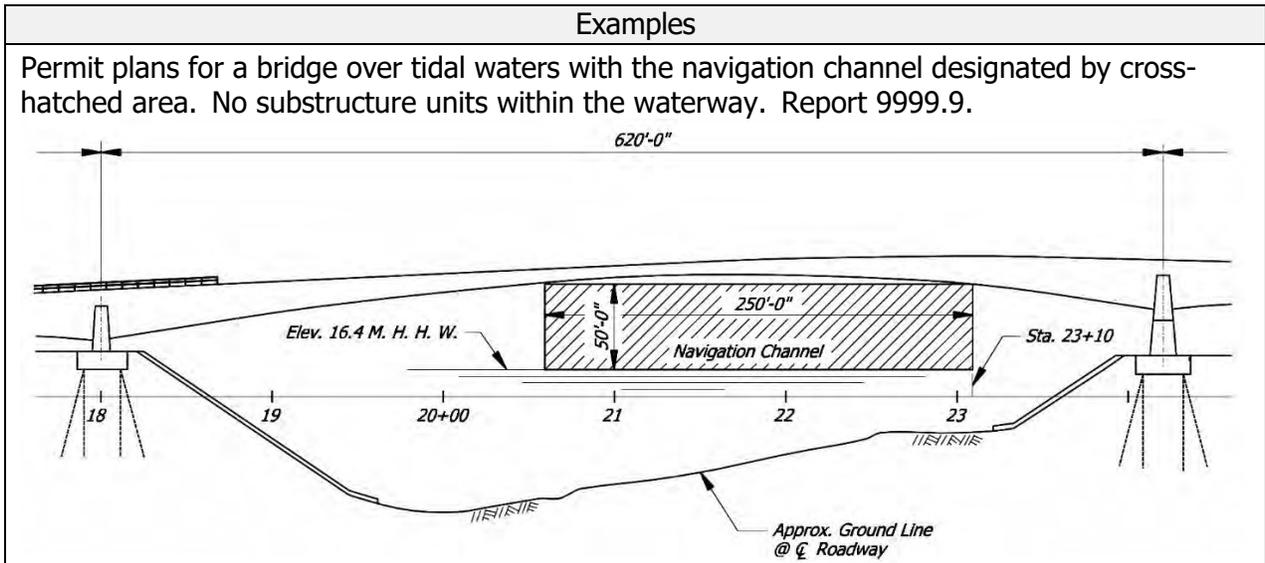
Bridge elevation view with no substructure units in the waterway. (Source: Alaska DOT)
